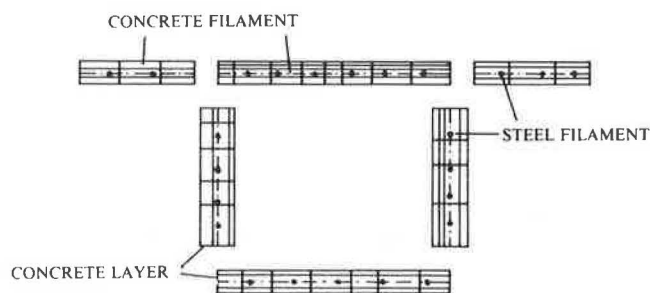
Box cross section discretized into concrete and longitudinal reinforcing steel filaments.
